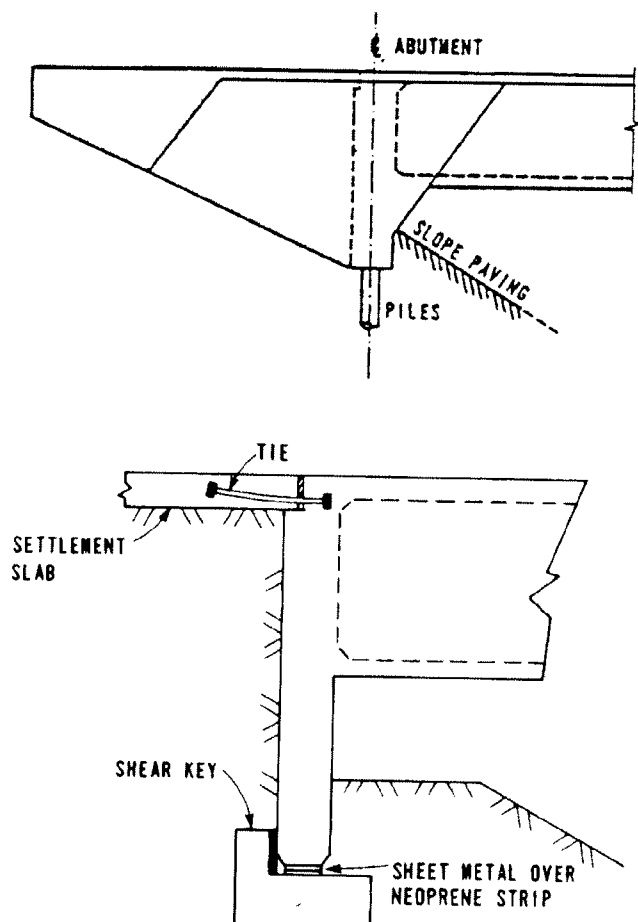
Typical Monolithic Abutment.
